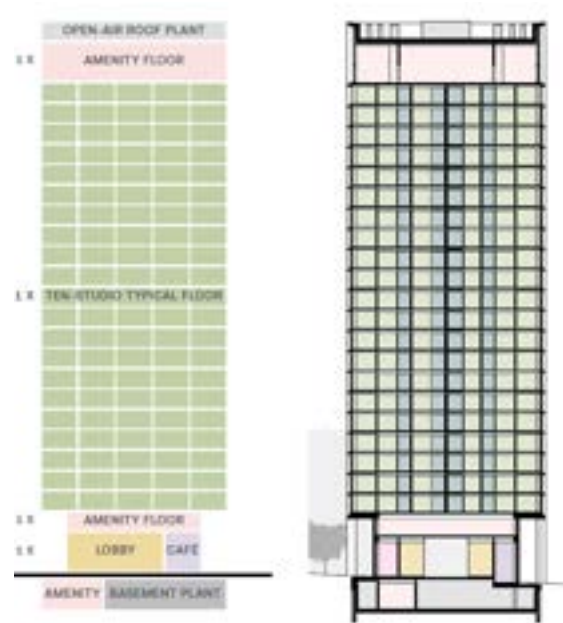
Diagram showing the sectional arrangement of the proposed student accommodation tower
